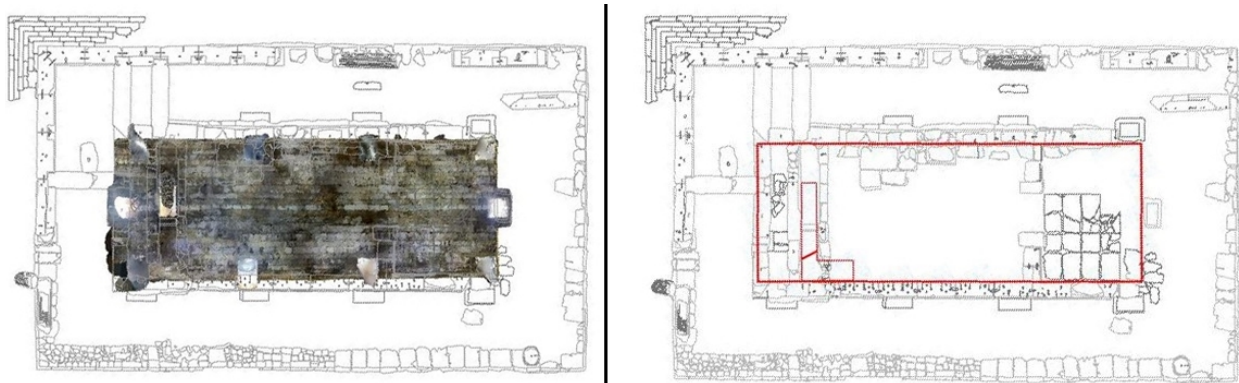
Temple Plan Drawing Point Cloud and Sub Gallery Plan shown in Red Area (Aizanoi Excavation Archive 2023).
